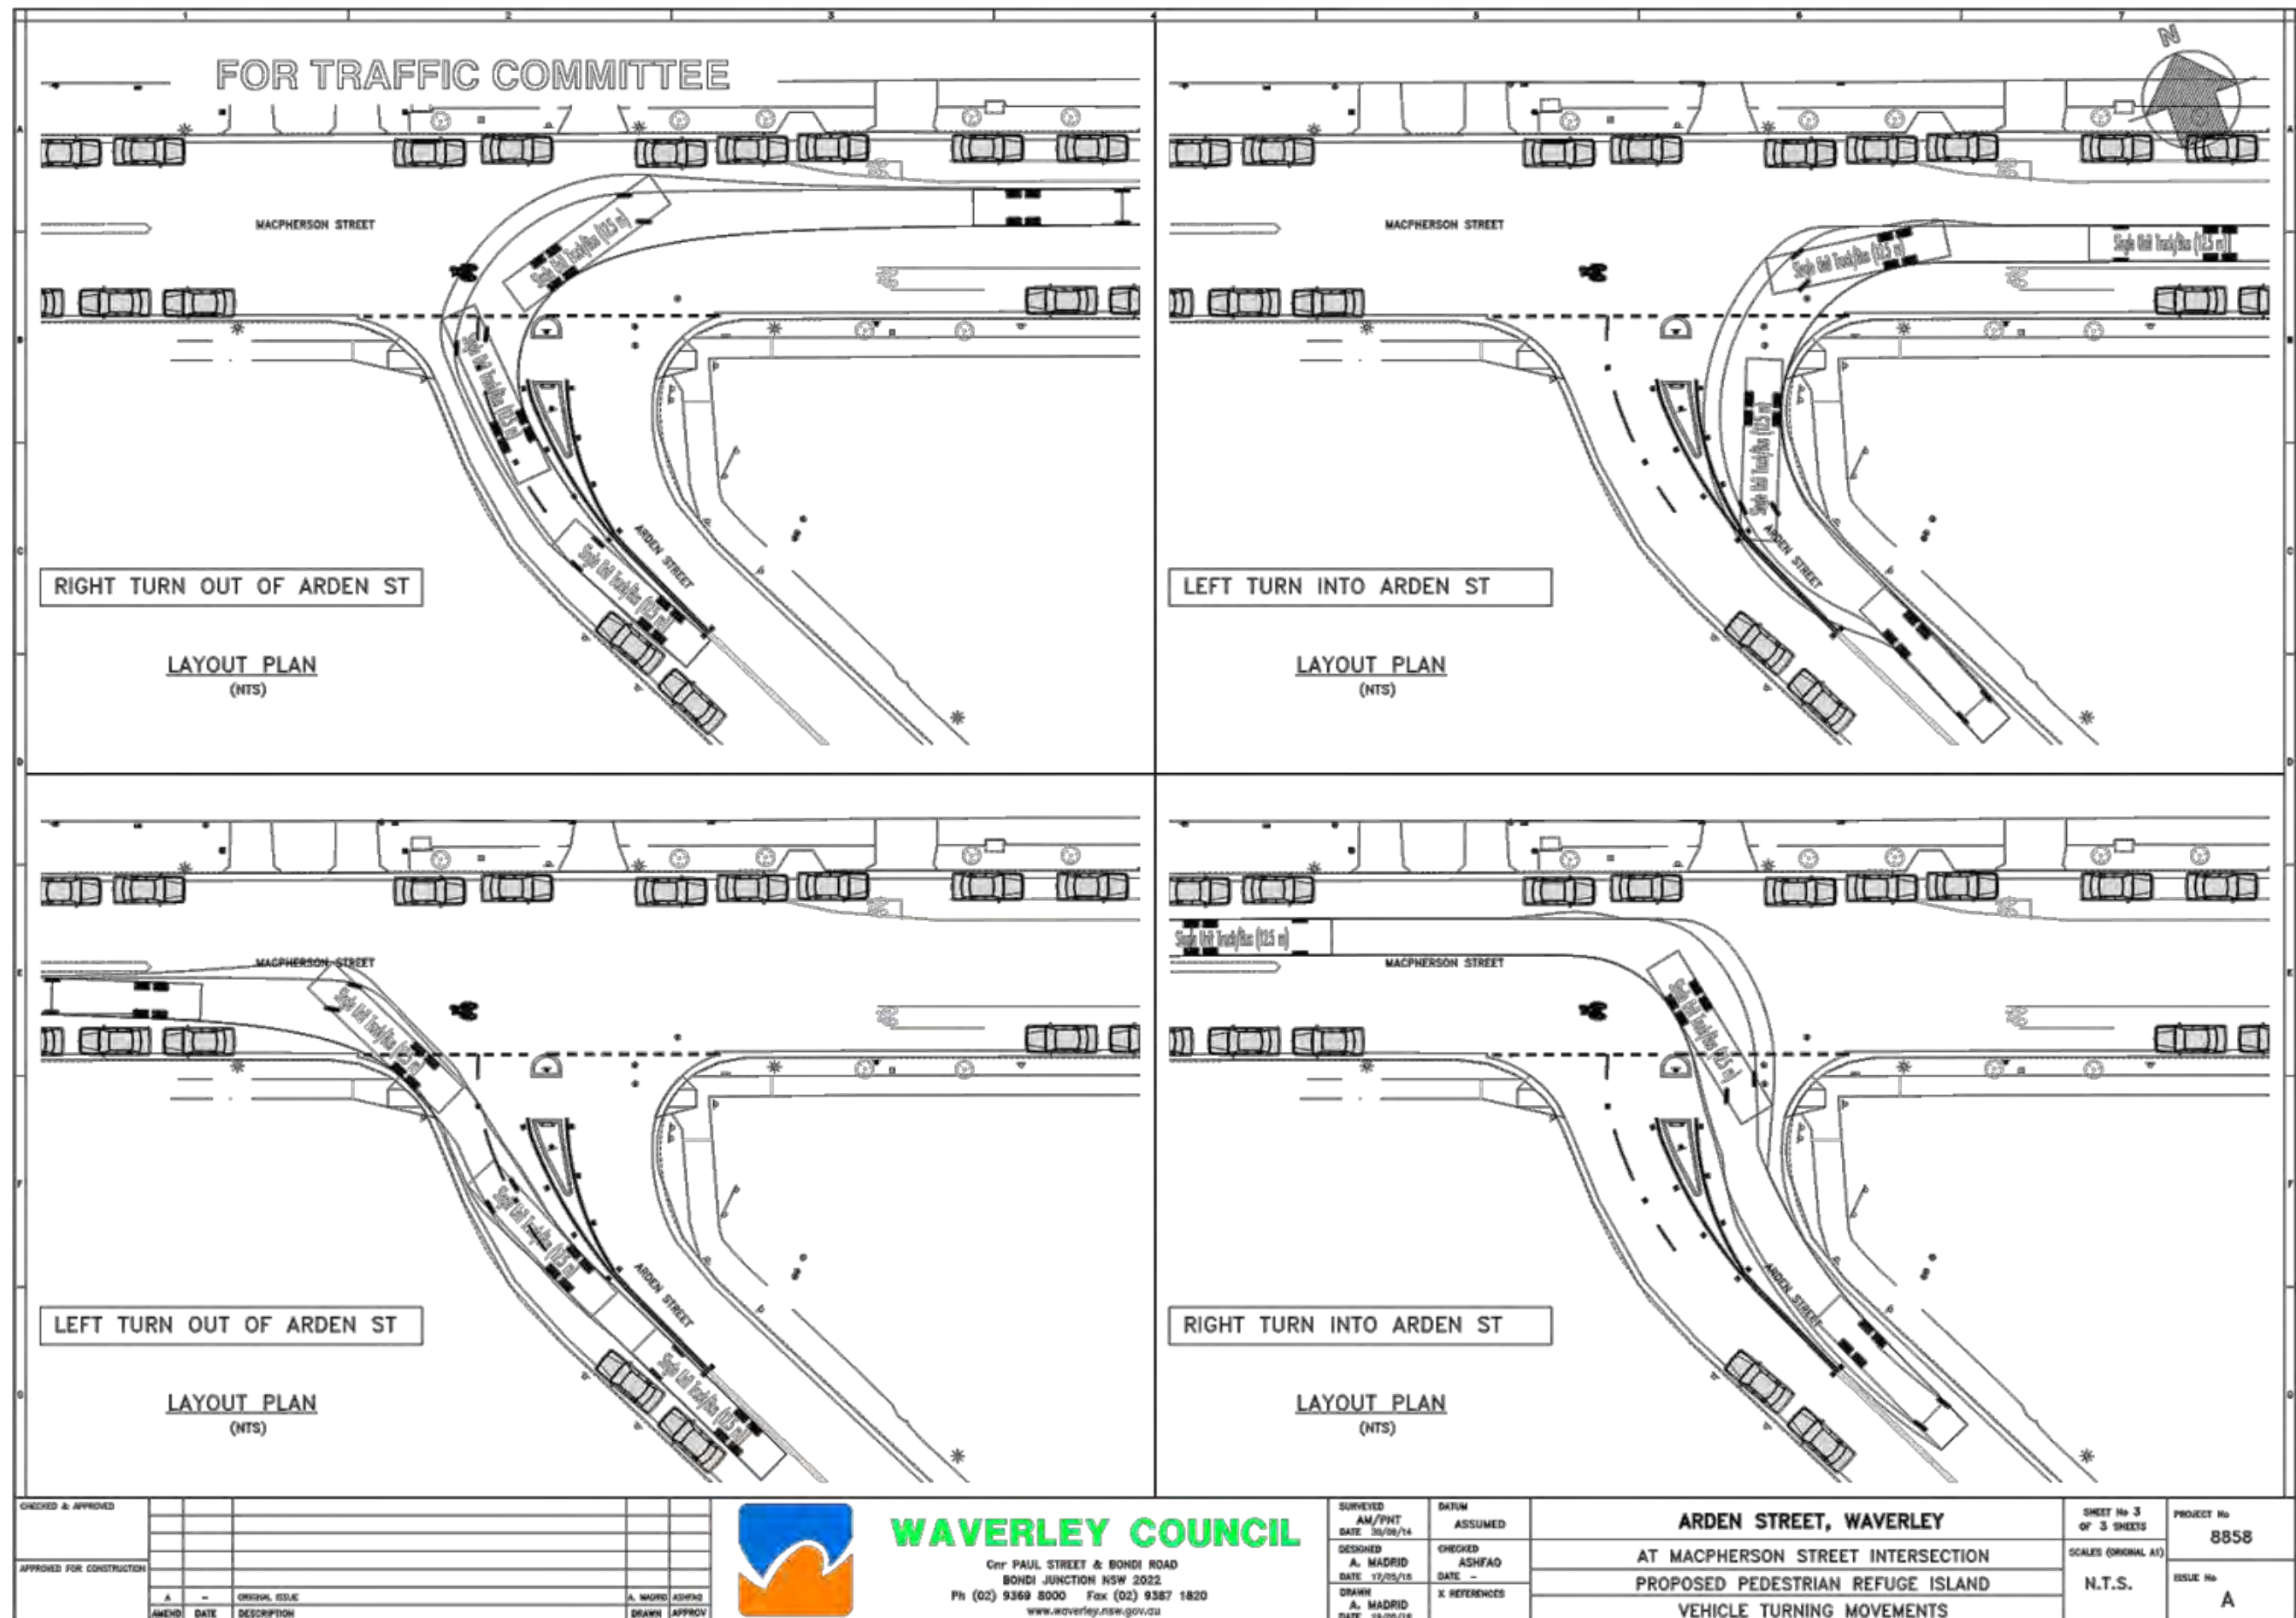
Current layout of intersection of Macpherson Street and Arden Street, Waverley
